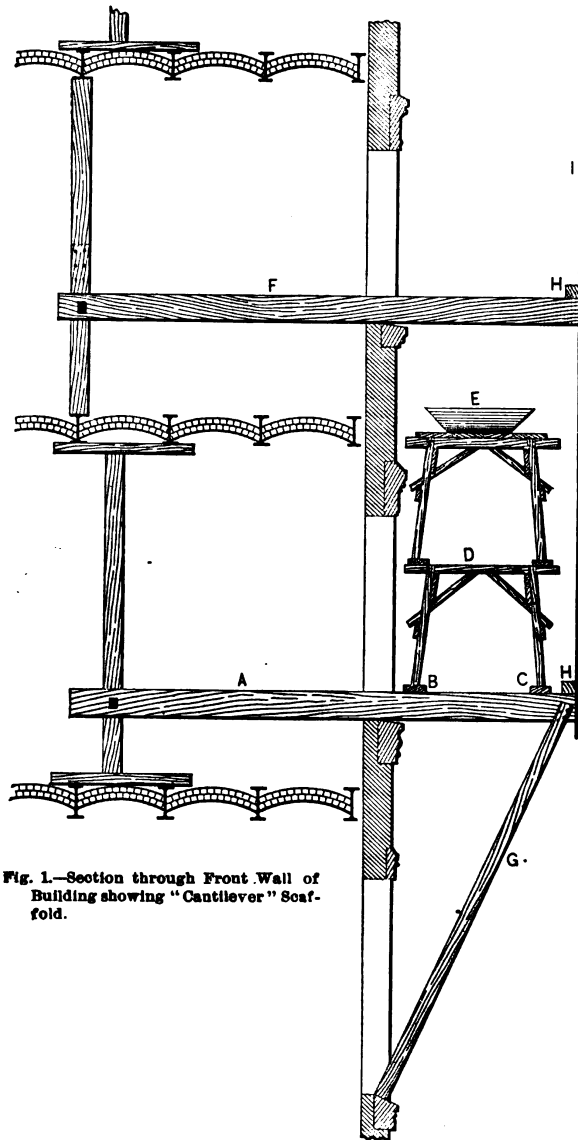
Section through Front Wall of Building showing "Cantilever" Scaffold.
